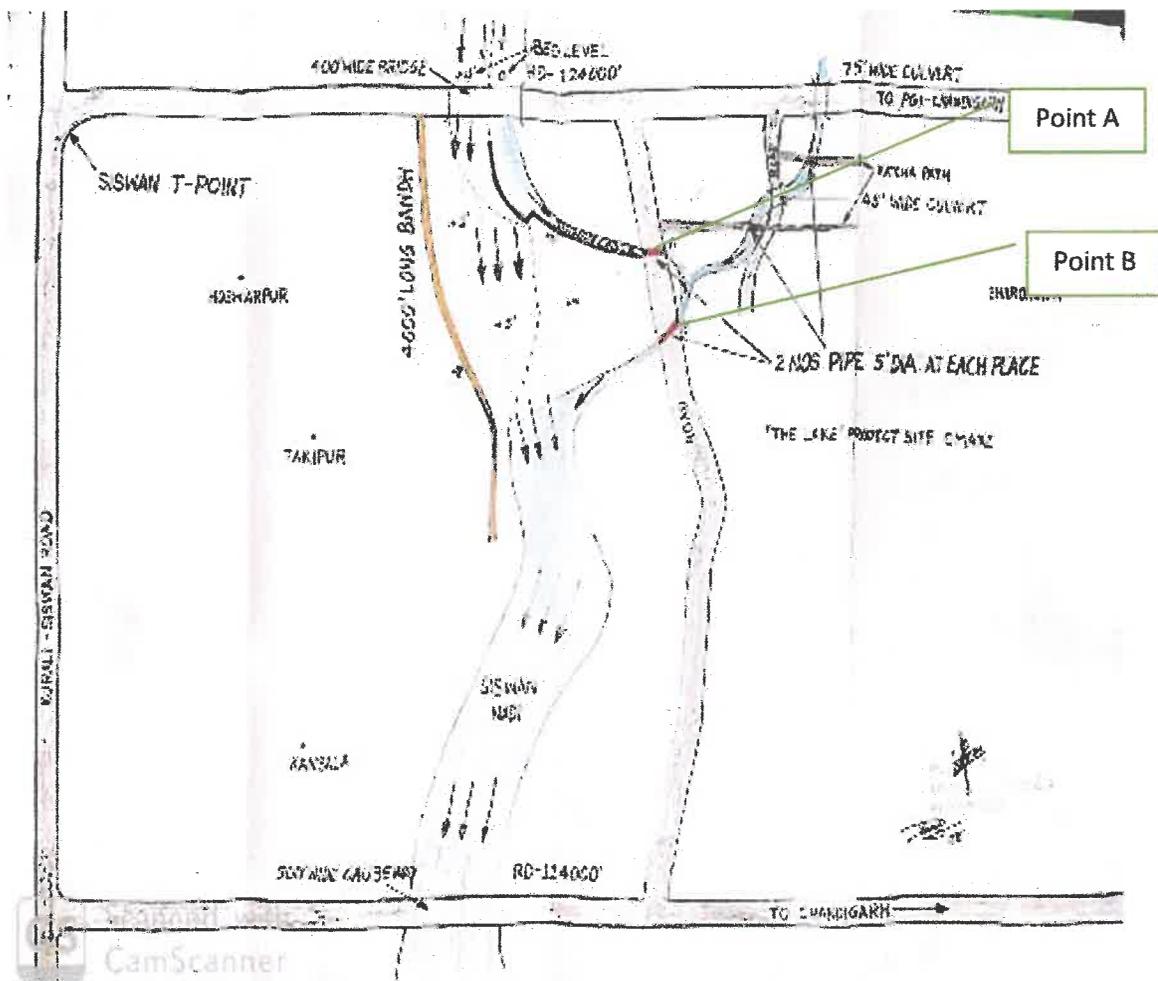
Two pipes of 5 feet Diameter provided at crossing point 'A'
